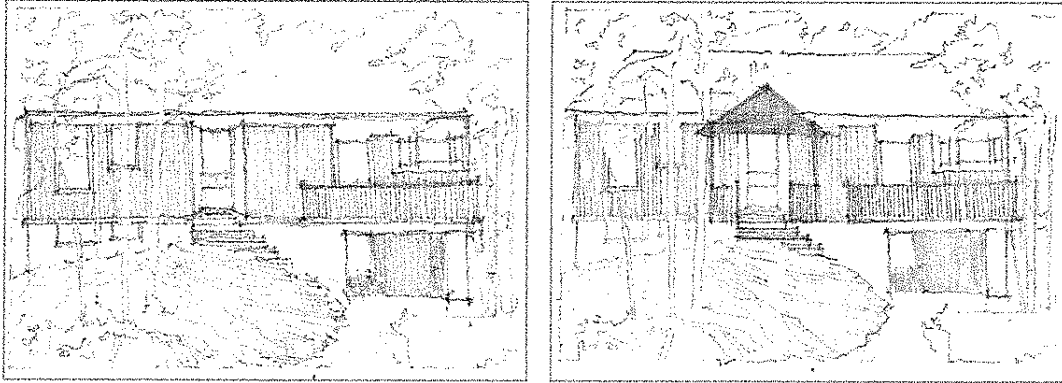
The sketch on the left illustrates an existing flat roofed house. The sketch on the right illustrates an inappropriate alteration to the original building (addition of a gable roof).
